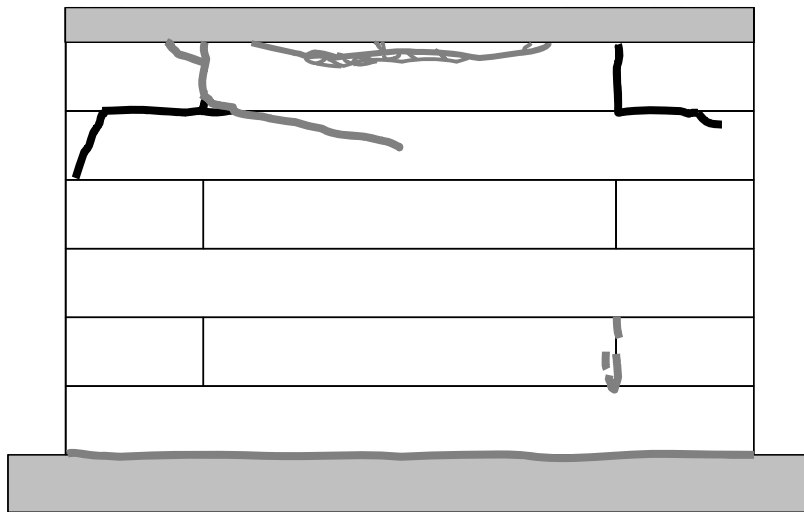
Cracking of Shear Wall Pilot Specimen 2 at Cycle 12 (discrete block rotation)
